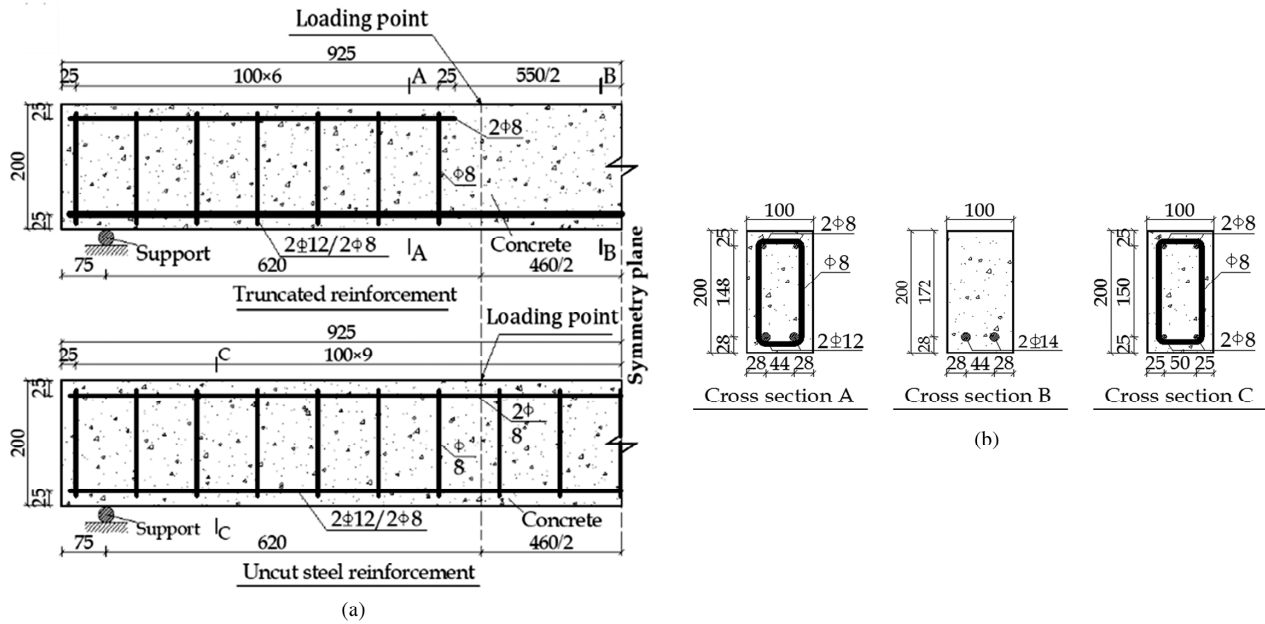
Reinforcement diagram of the reinforced concrete specimens: (a) front view and (b) side view (units: mm).
